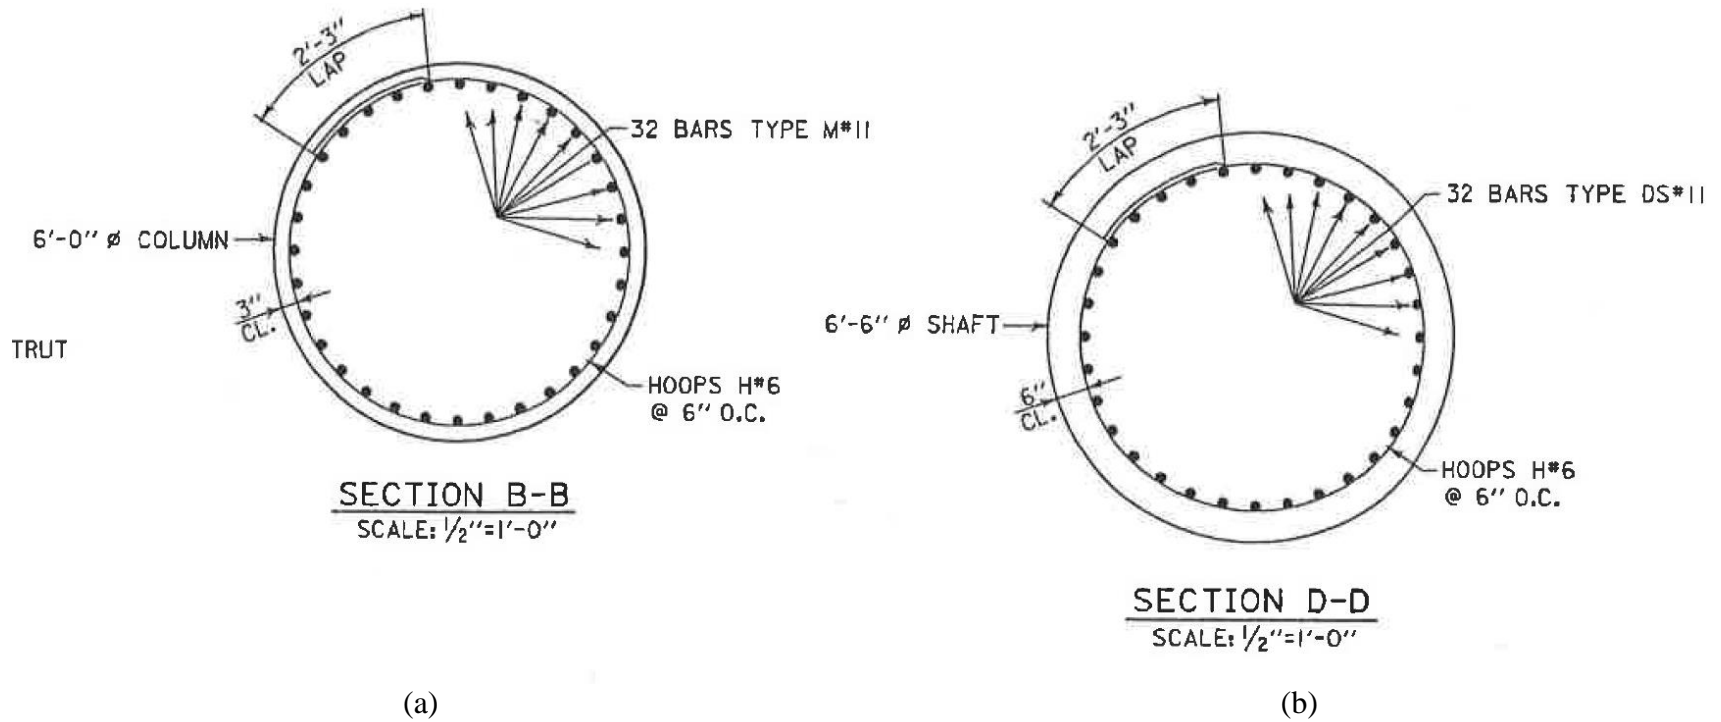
Marshall County Bent 3 (a) above ground and (b) below ground column and shaft cross section (ALDOT 2003)
